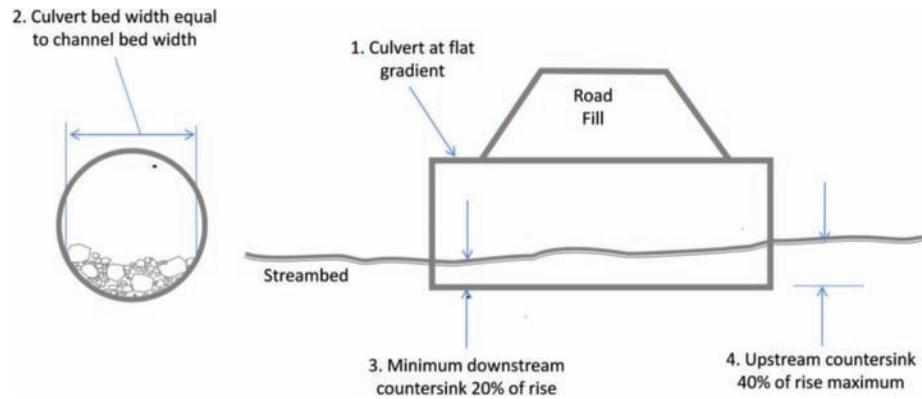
Sketch of a no-slope culvert design according to Barnard et al. (2013) for Washington State.
